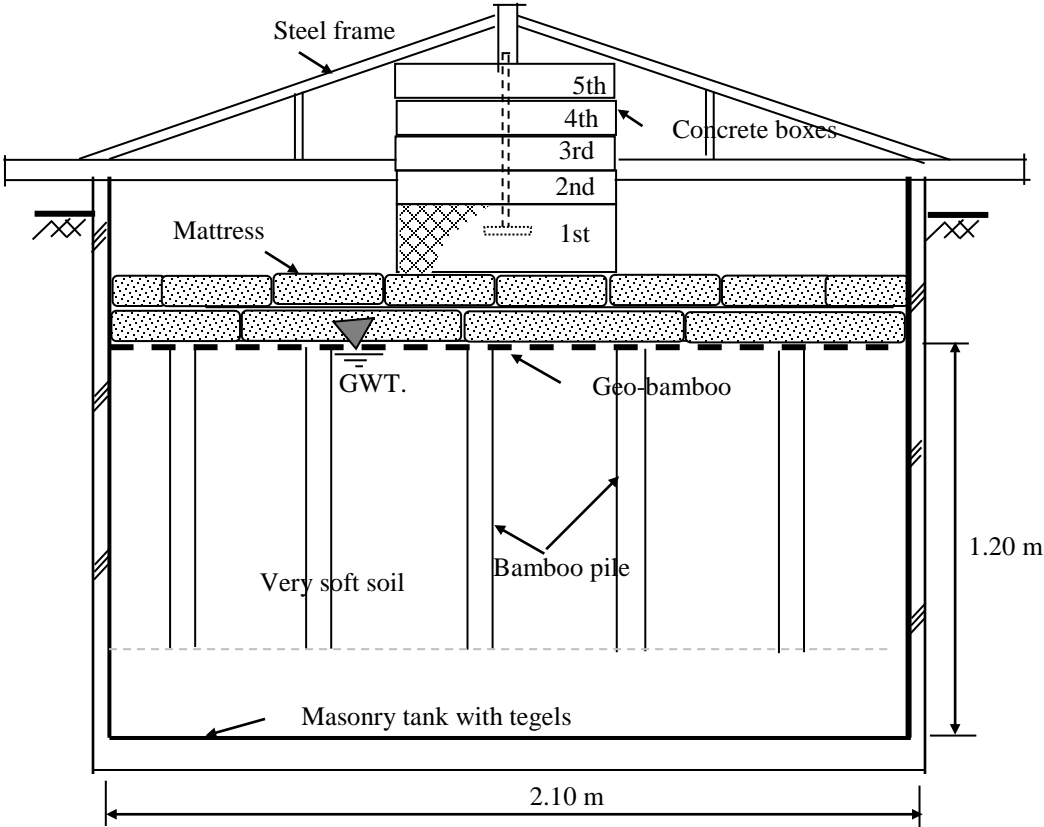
Long-section of the full-scale test by placing concrete boxes at point-2
